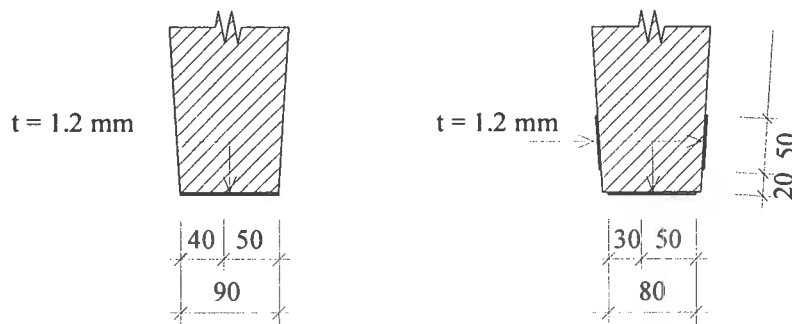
Arrangement of the CFRP plates (beam no. 3 and no. 4)
